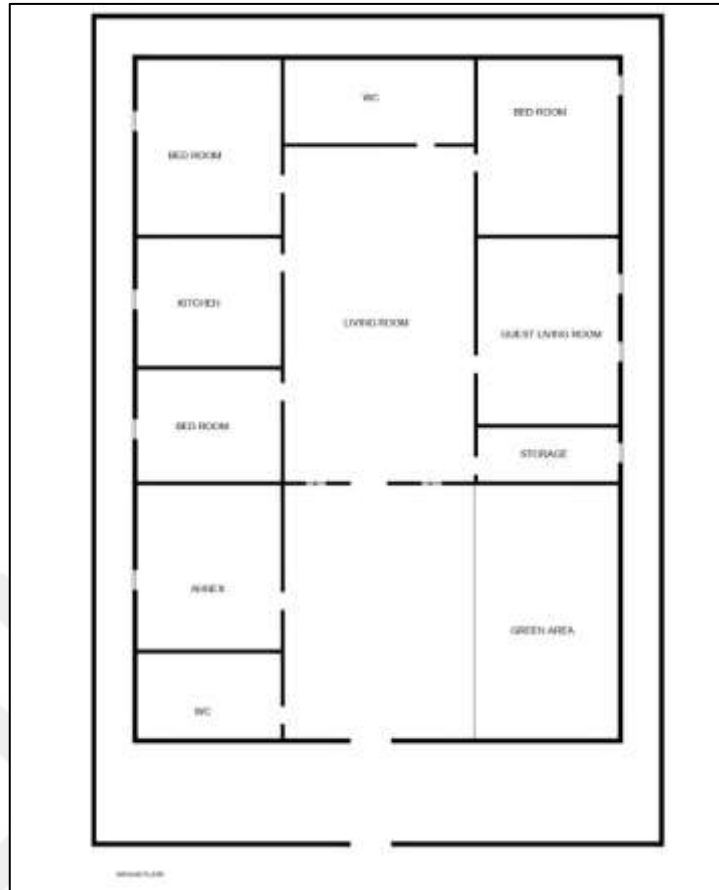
Villa House Example in Al-Malaz for Interior Arrangement Drawn by the Author.
